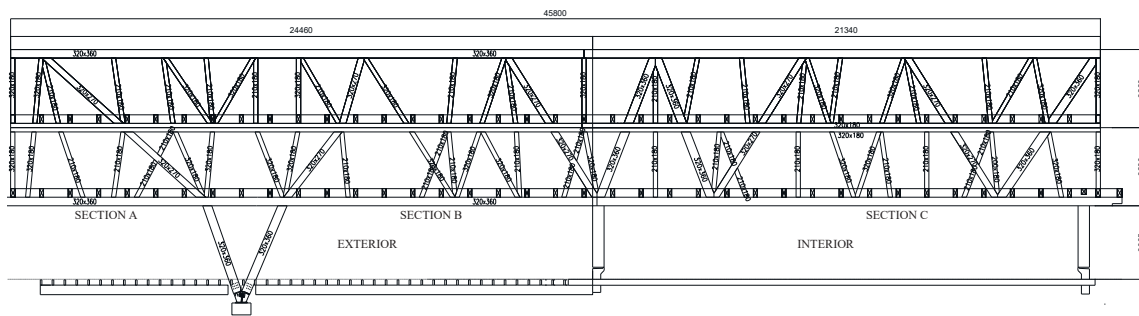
Geometry of the South truss (overhang on the left side), with the biggest cross-sections and loads
